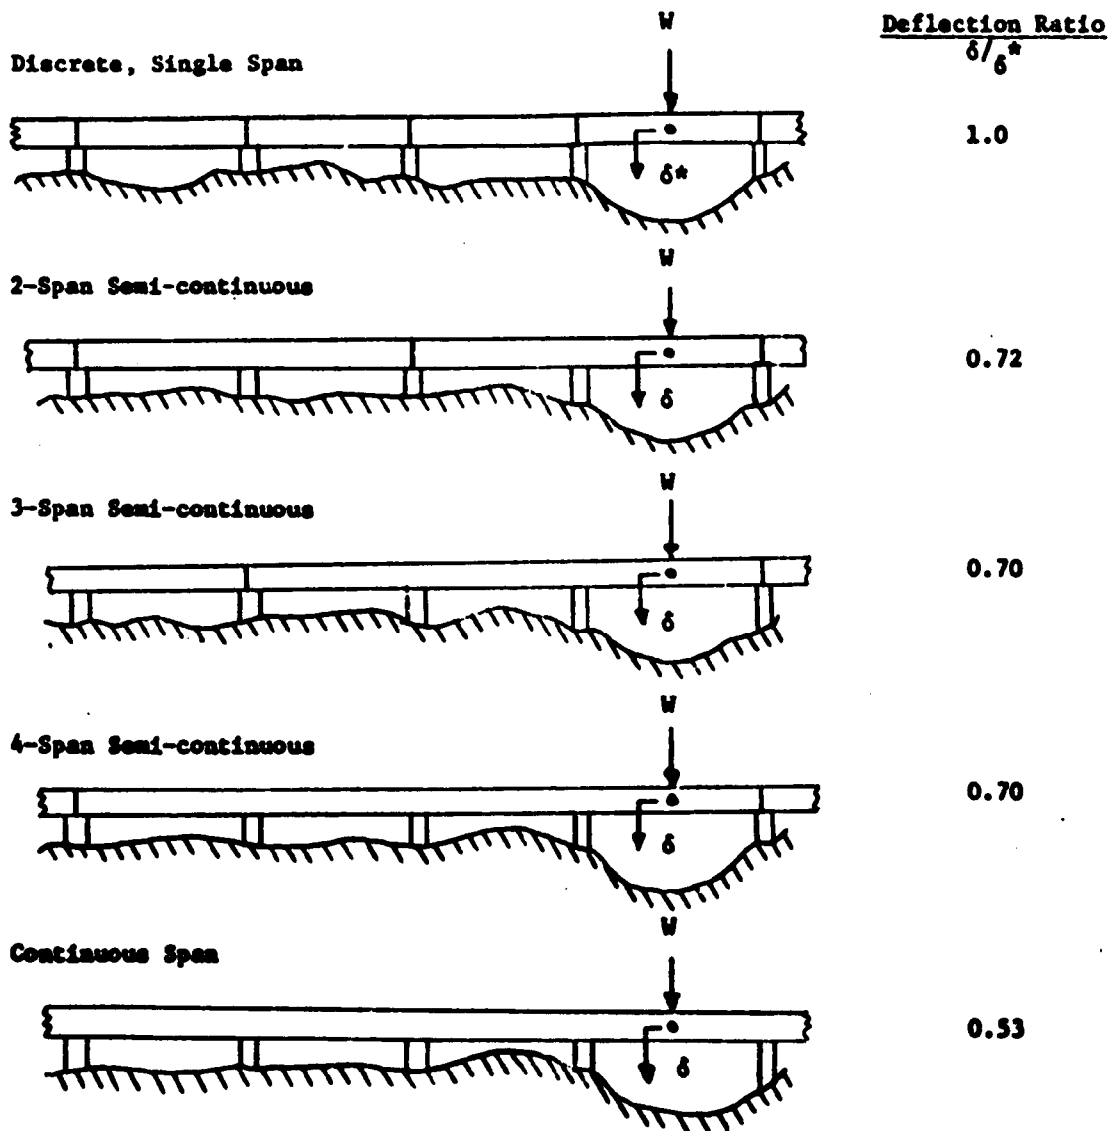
Single, Multispan and Continuous Span Configurations
